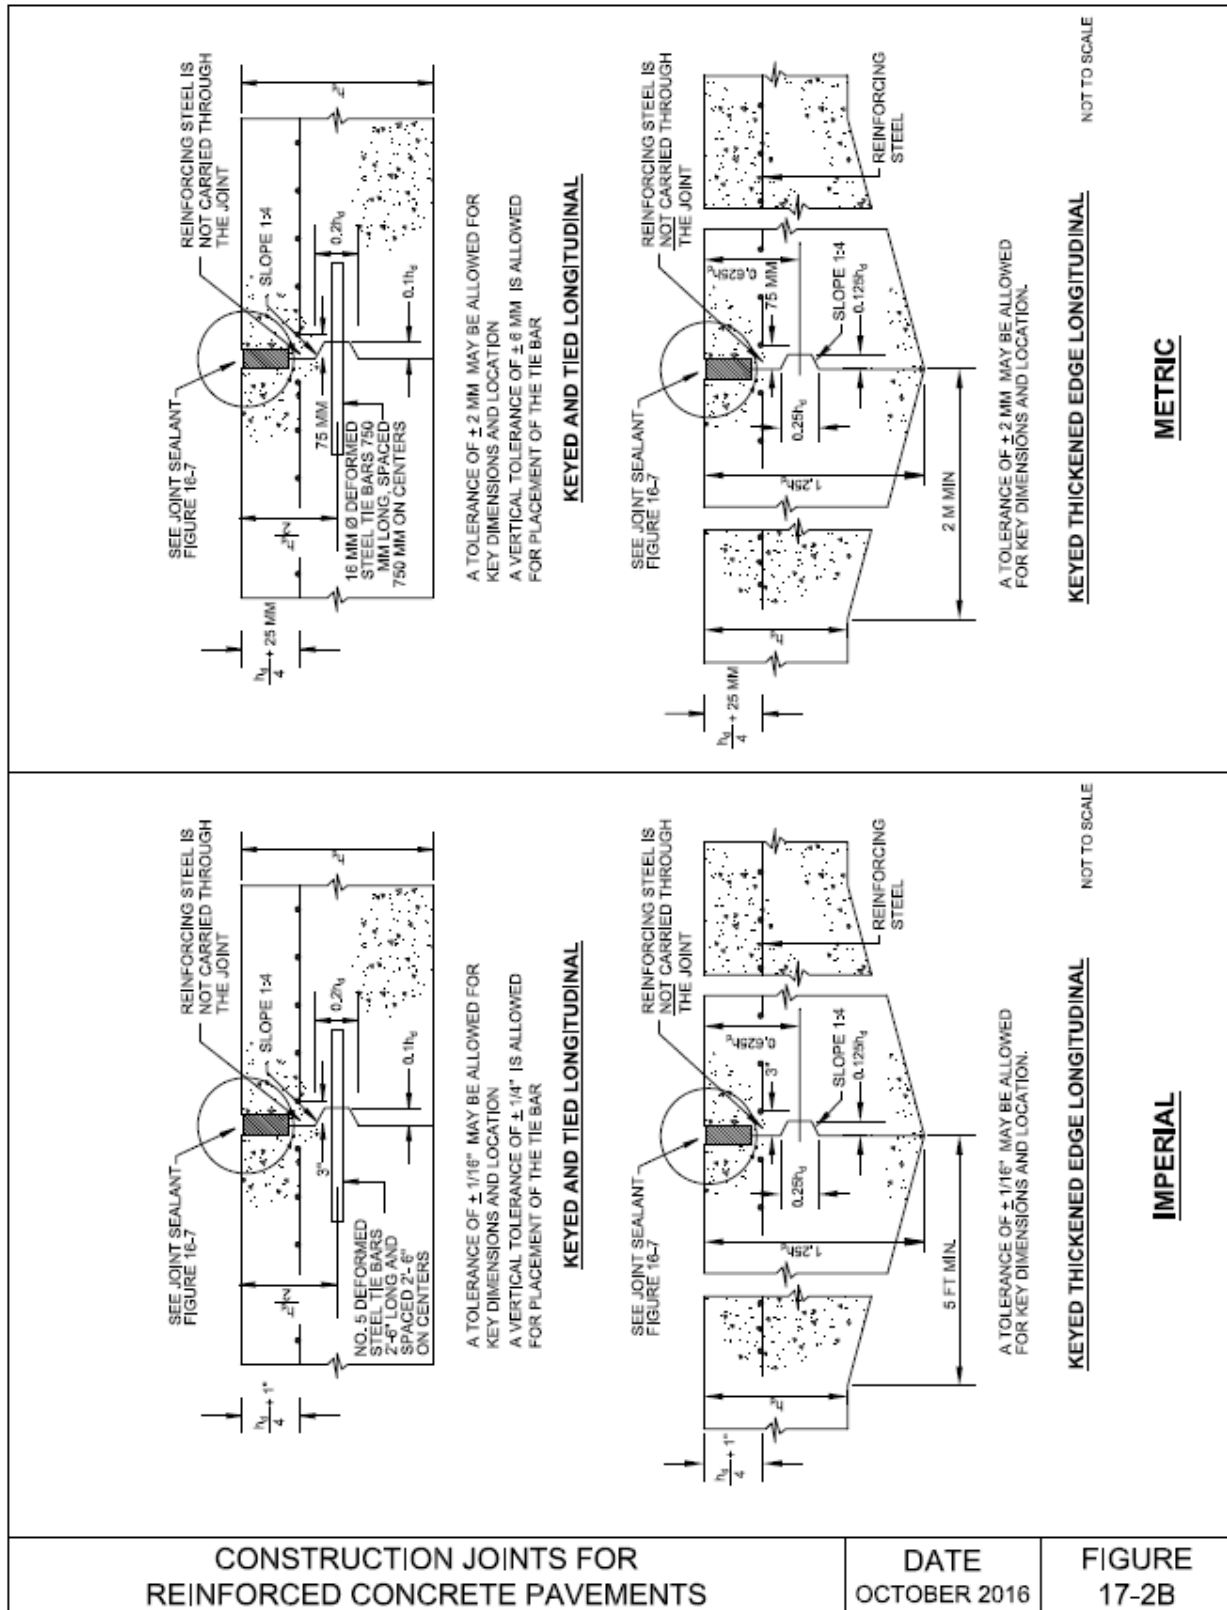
C Construction Joints for Reinforced Concrete Pavements
